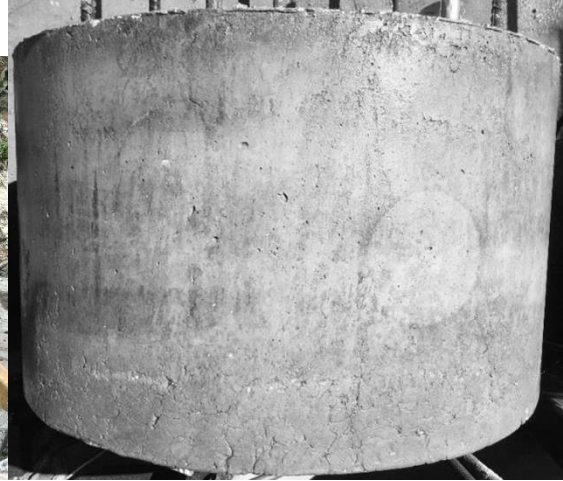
Shaft 20: f'_c 4100 psi; drilled shaft mix; 121 sec/qt polymer; smooth; faint creases.
